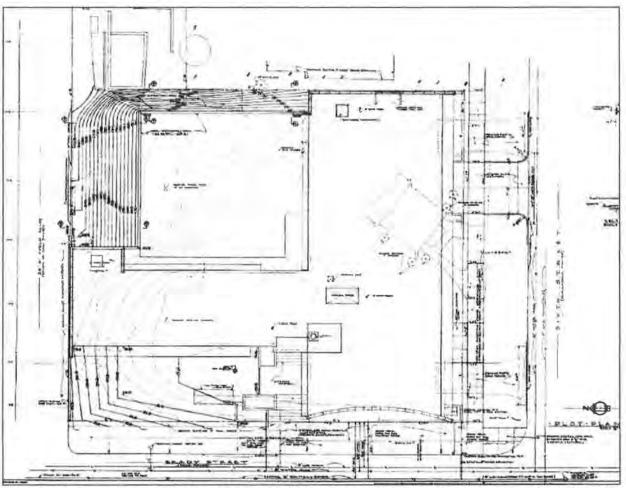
Pre-existing site plan (Original architect's drawings, 1957, in the owner's archives)
